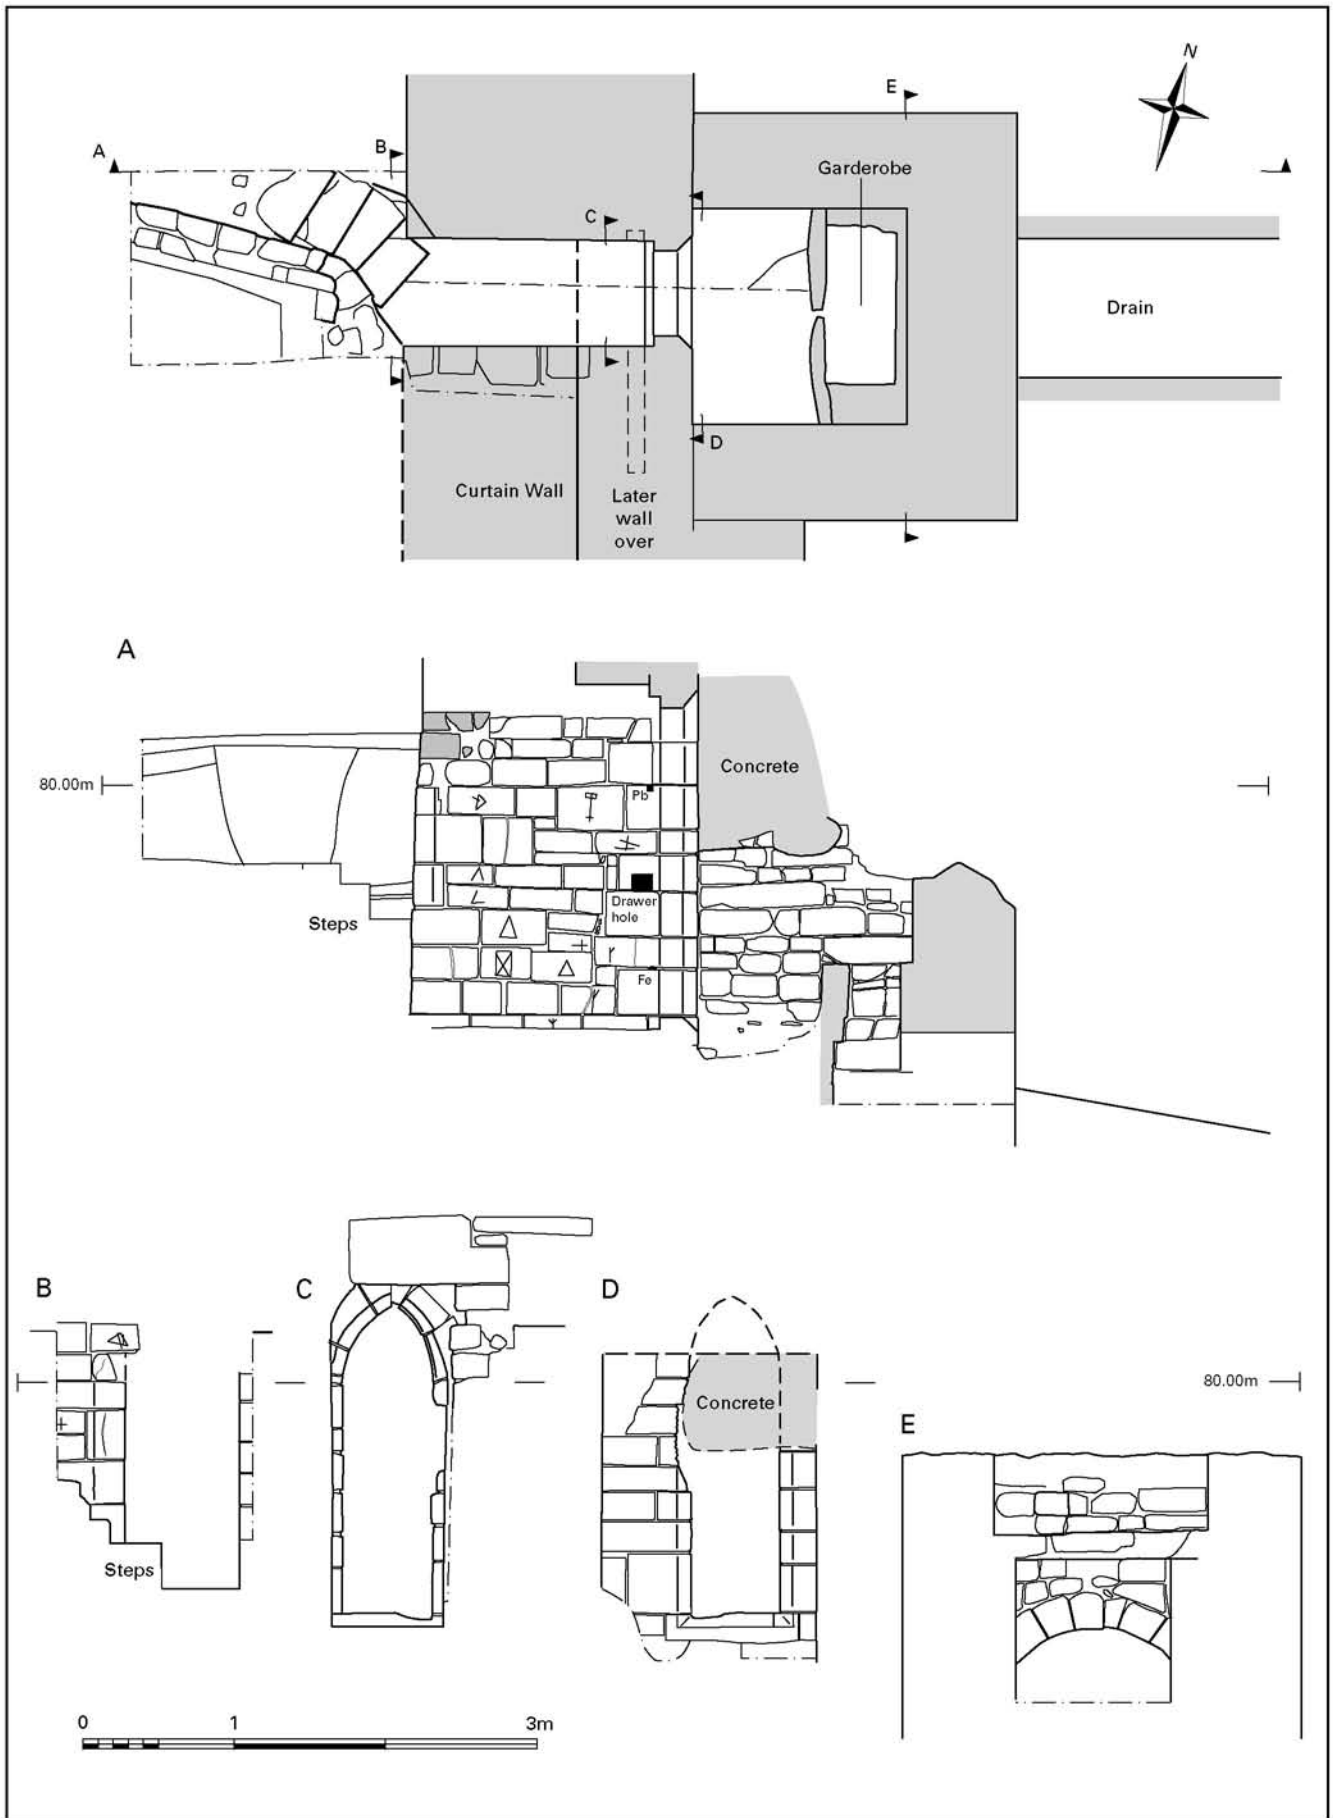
Kenilworth Castle, Lunn's Tower sally port, plan and elevations
